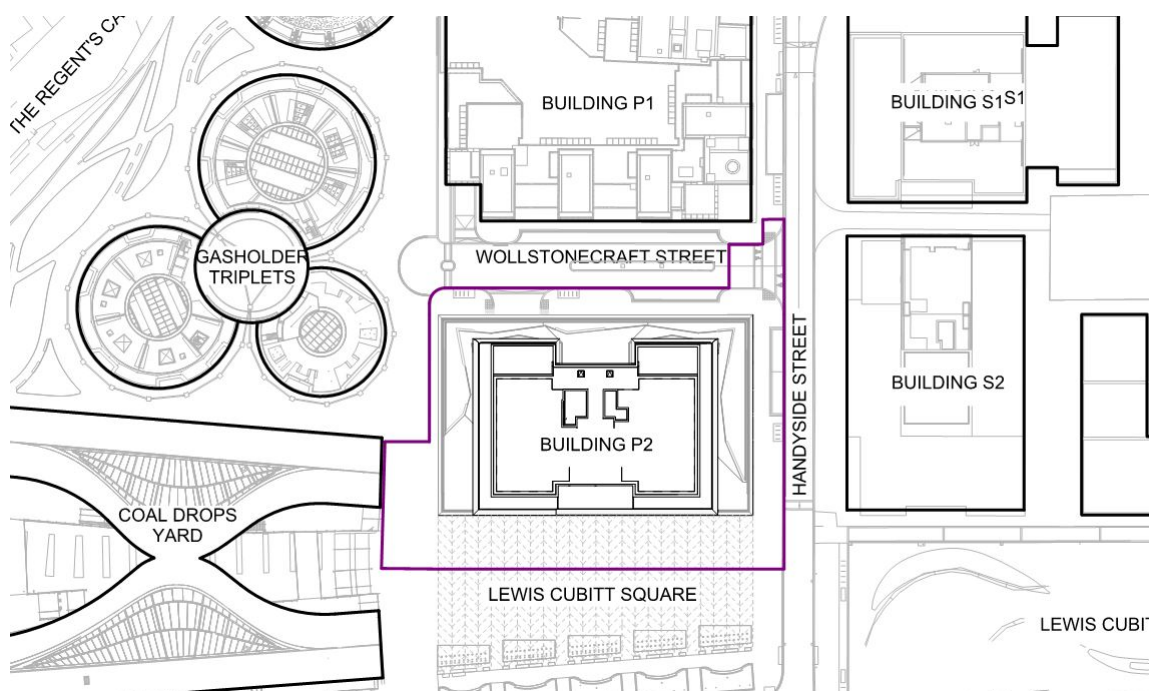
Building P2 location plan with the reserved matters boundary in purple.
